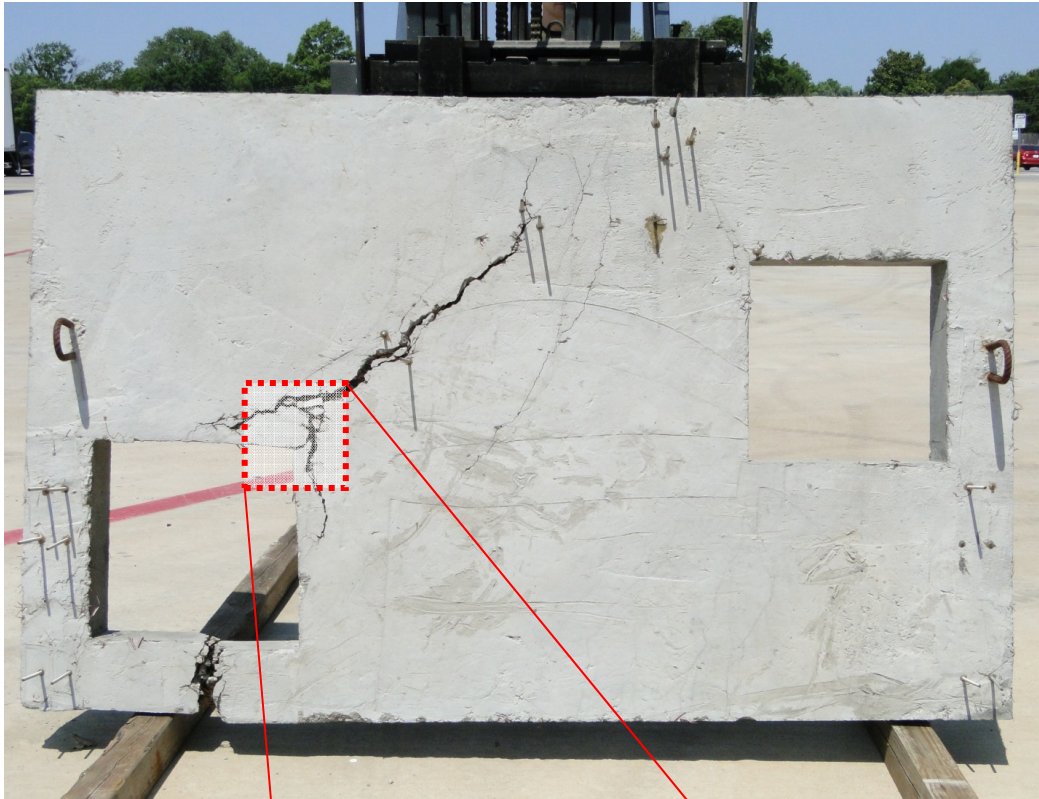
Failure along the horizontal segment of opening in SFRC #2 specimen at final stage
